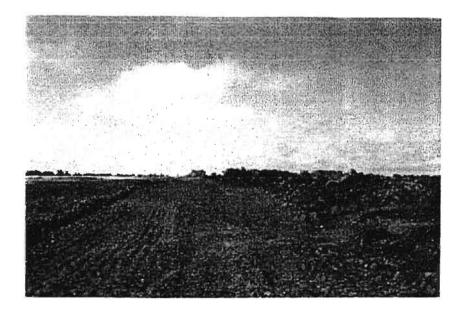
Station 20+00. Looking to the south along the alignment of the dike. Photo was taken after the first lift of borrow was placed.
